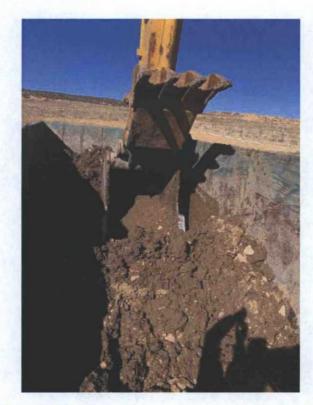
Mixing the drill cuttings with clean soil from trench excavation. Stablization was achieved at a ratio of 1 (clean): 1 (cuttings).
